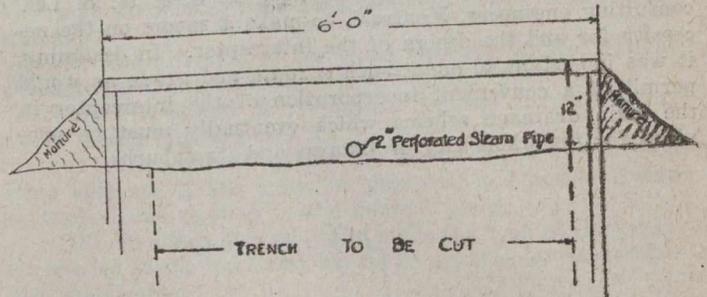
THAWING GROUND CHEAPENED EXCAVATION
